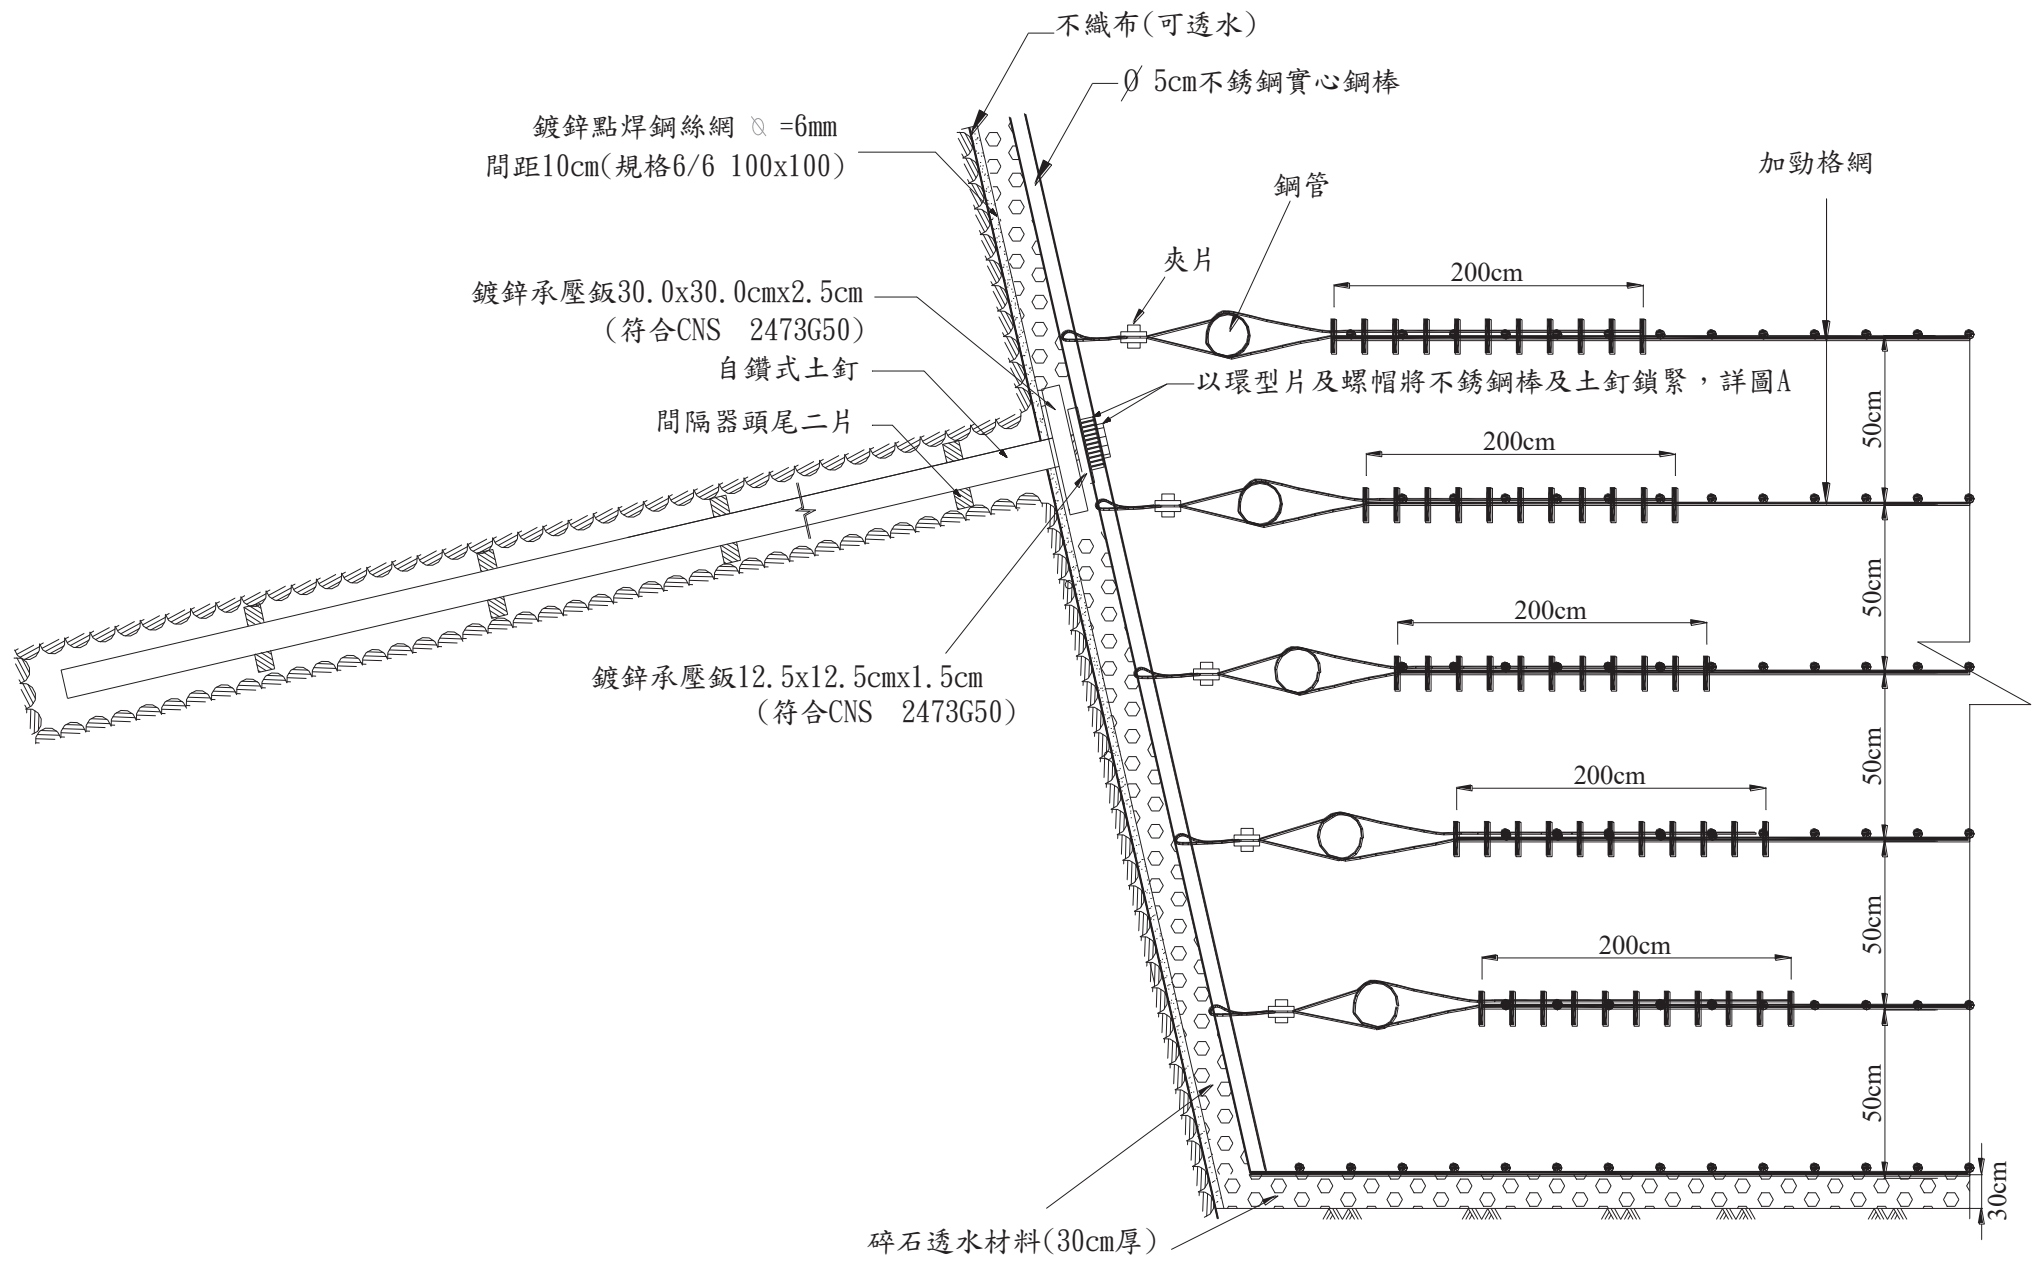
Combination of MSE Wall and Soil Nail Through Connecting System
